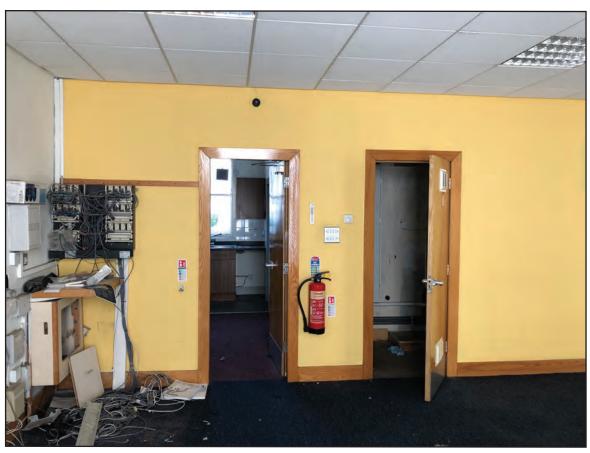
Room 2, general view of the west side of the north wall, from the south
